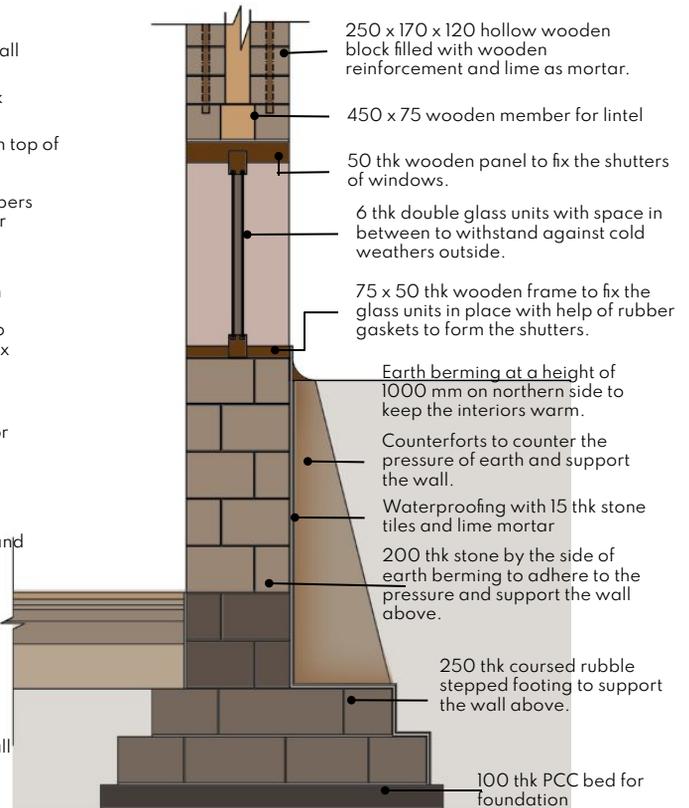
Detail section through external wall on north side showing earth berming and foundation details
